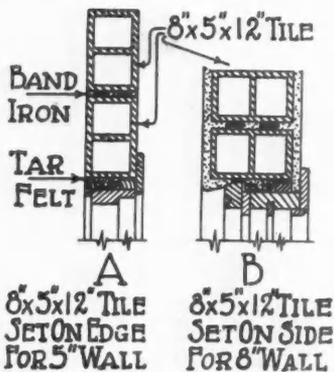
Showing Method of Reinforcing Walls Over Window Openings with Band Iron, Where Regular Lintels Are Omitted.
